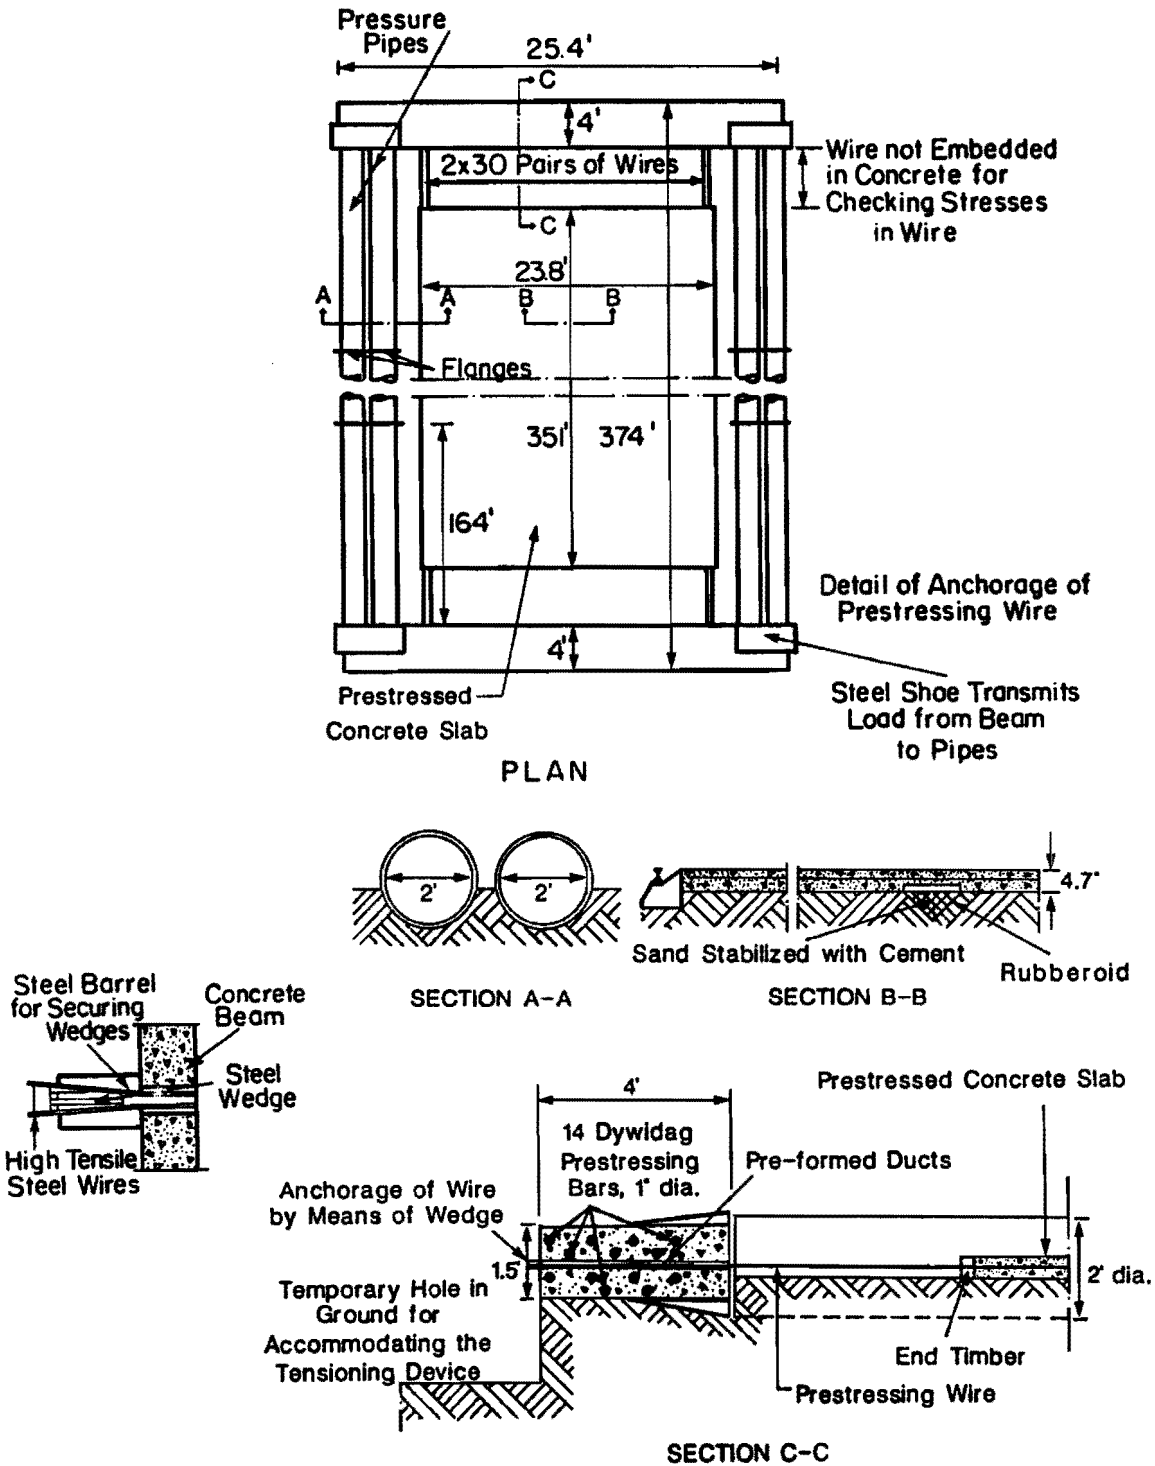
Pretensioning frame for prestressed pavement at Leidschendam, Netherlands (Ref 56).
